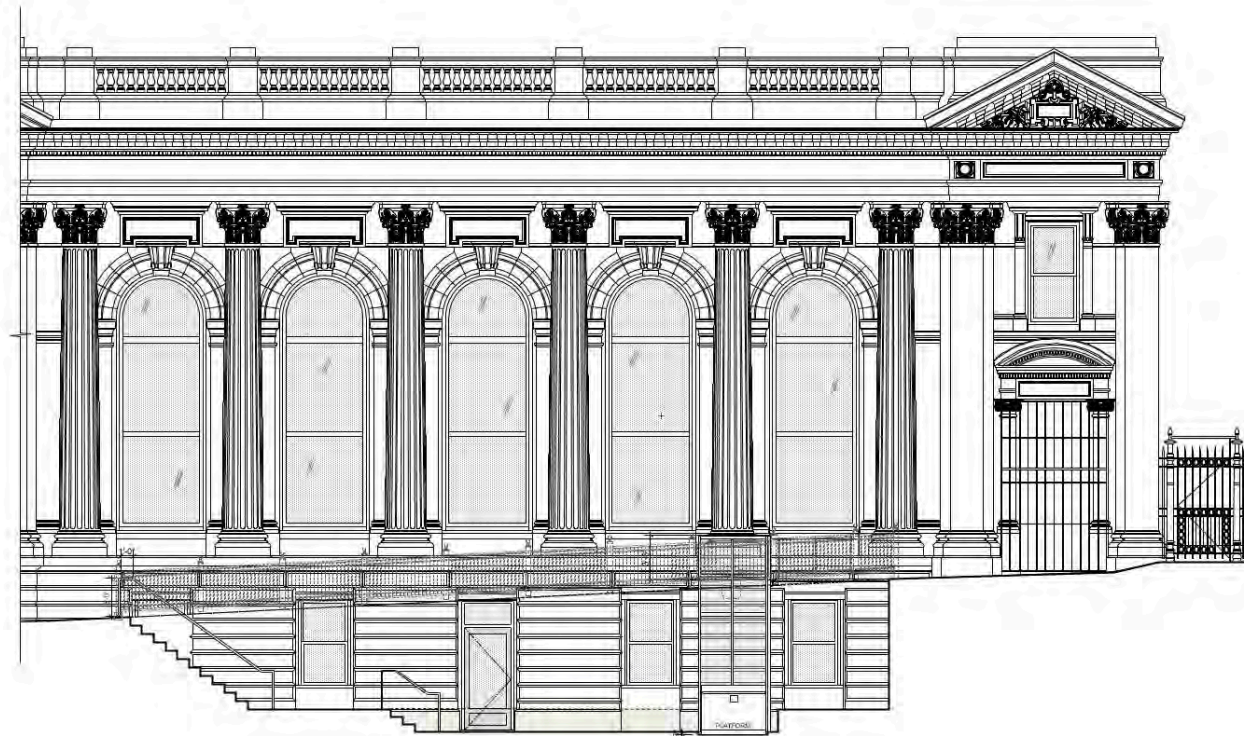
This section drawing shows the Jones Street (East) light well. The light well is accessed by a stair that is located just to the north of the Entry Rotunda (left in this drawing). The proposed change includes lowering the floor of the light well, adding 3 stairs, adding a new door and transom at the center bay and adding the HC-lift between the two northern-most basement windows.
